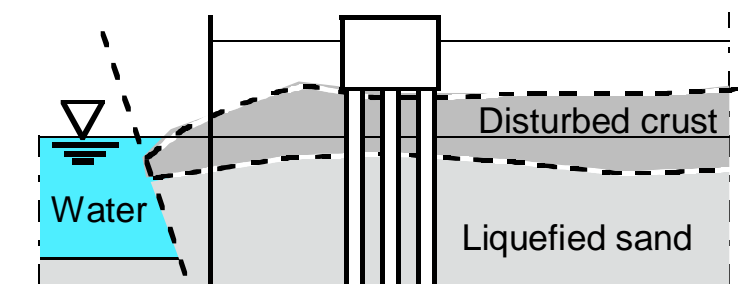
Deformed configuration of backfill soils and sheet pile wall in Test 14-2, after shaking
